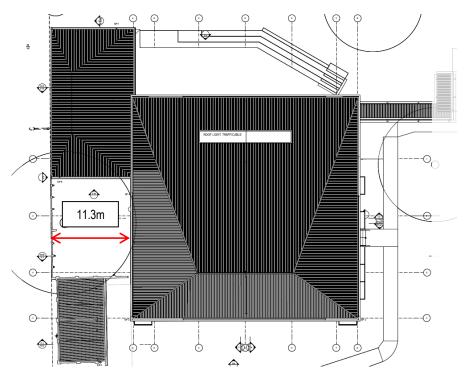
Proposed hall and ancillary buildings (roof plan) and proposed setback to O'Connell Street
